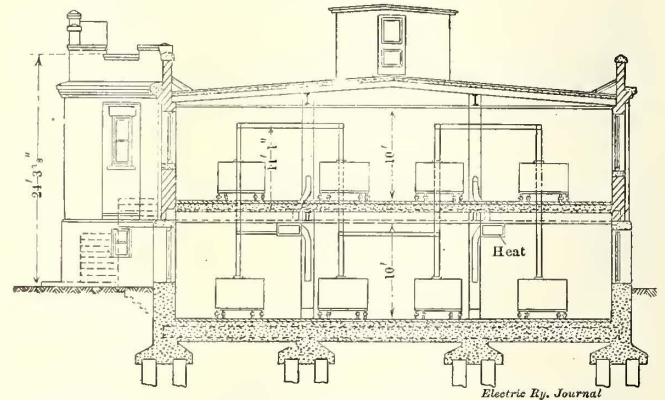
Detroit Tunnel—Cross-Section of Substation Along Line G-G Shown on Plan
